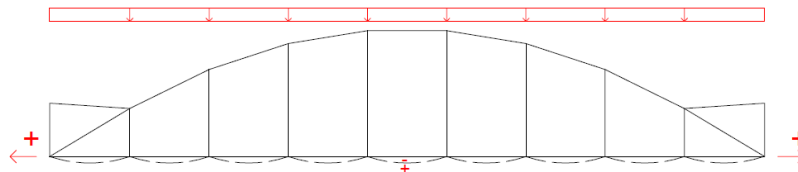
Schematization load combinations, tensile (+) and compressive (-)
